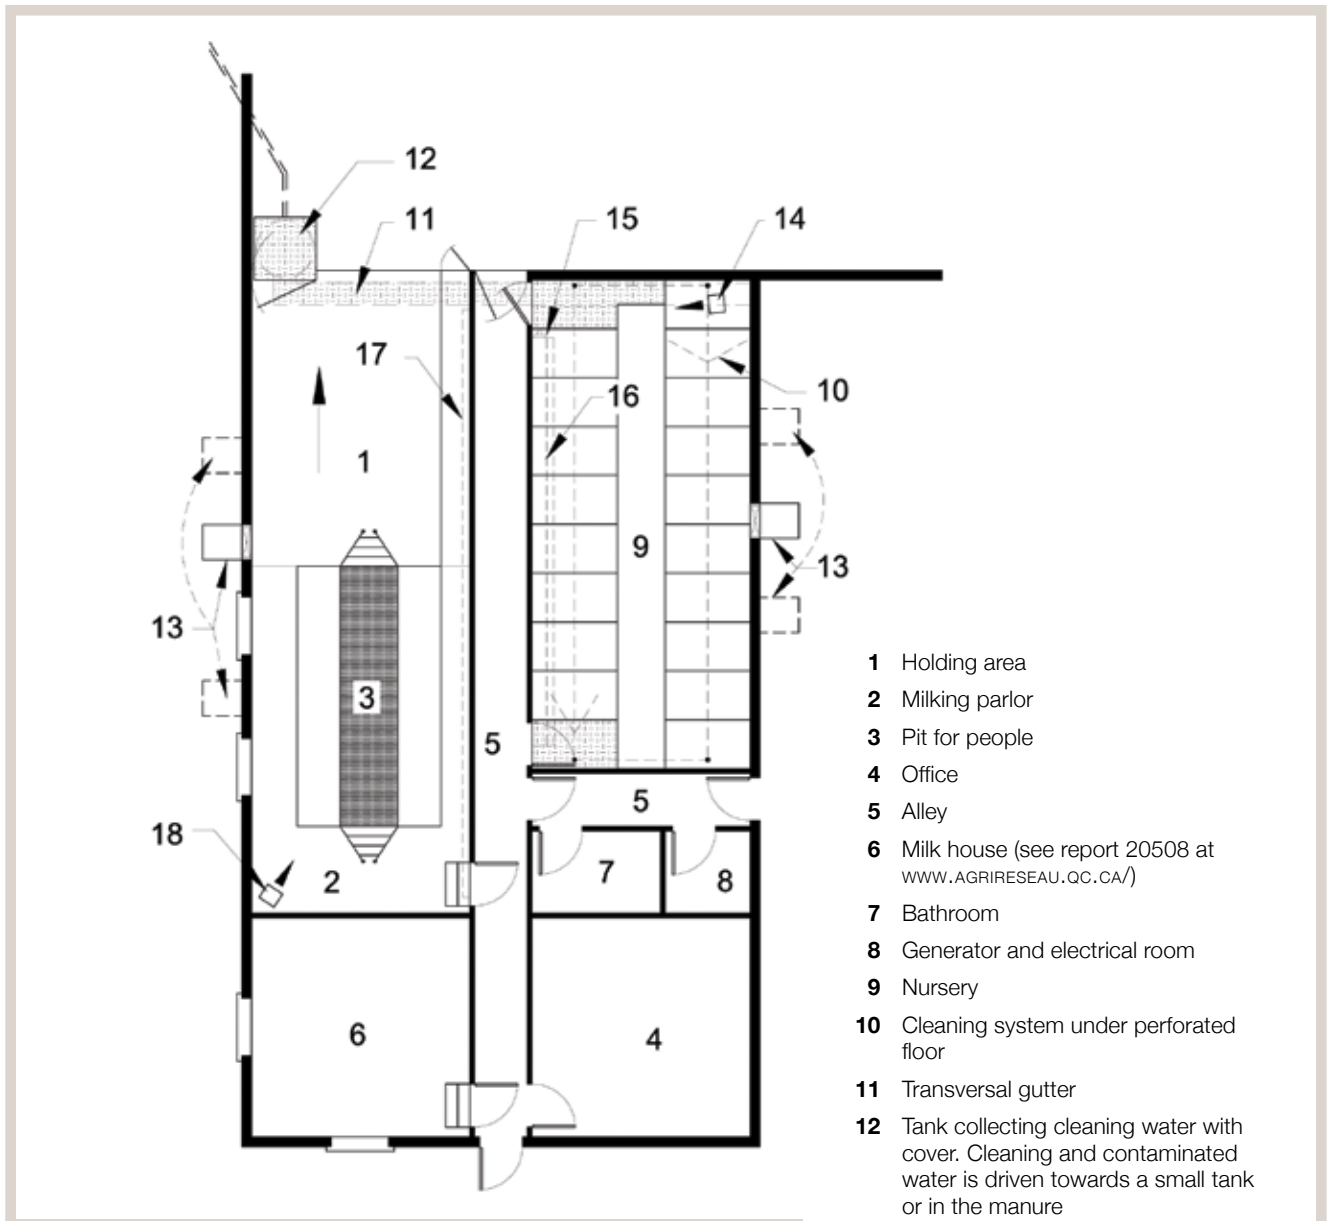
Barn floor plan for nursery, milk house, milking parlor and office area
